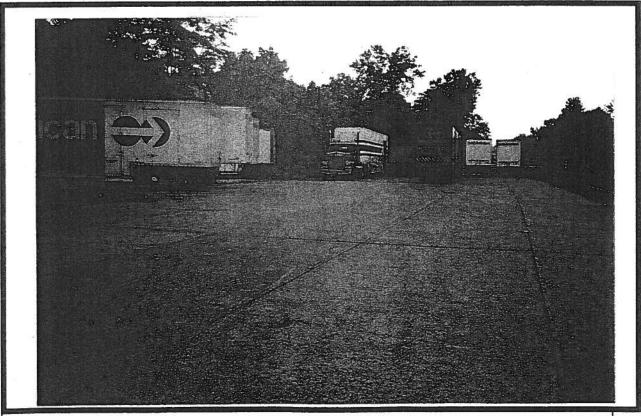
Concrete Apron/Roadway by Old Depot Page 37 of 46
